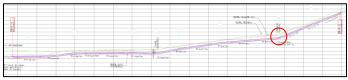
NEW PIPELINE LAYOUT ON VERTICAL AXIS
